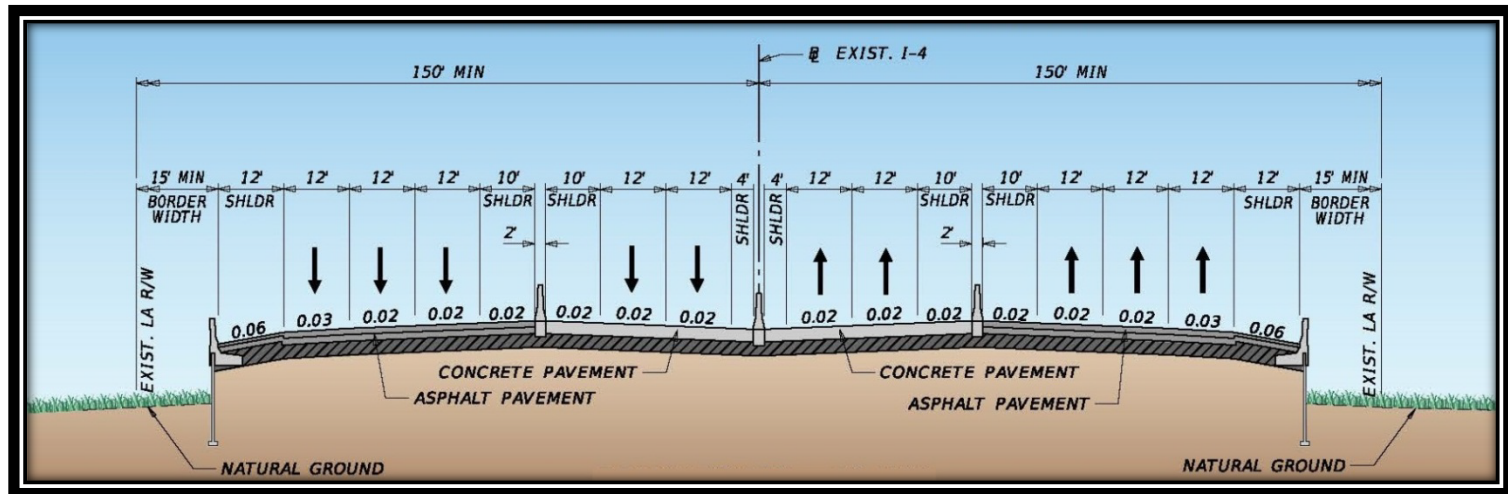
Proposed Typical Section (6+4 without rail envelope) – SR 528 to W. of SR 435
